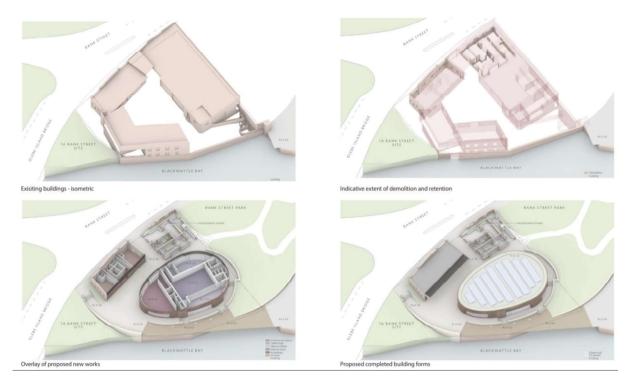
Isometric diagrams illustrating extent of demolition, re-use, and construction of new works within 1–3 Bank Street. (Source: Oculus, 2023)
